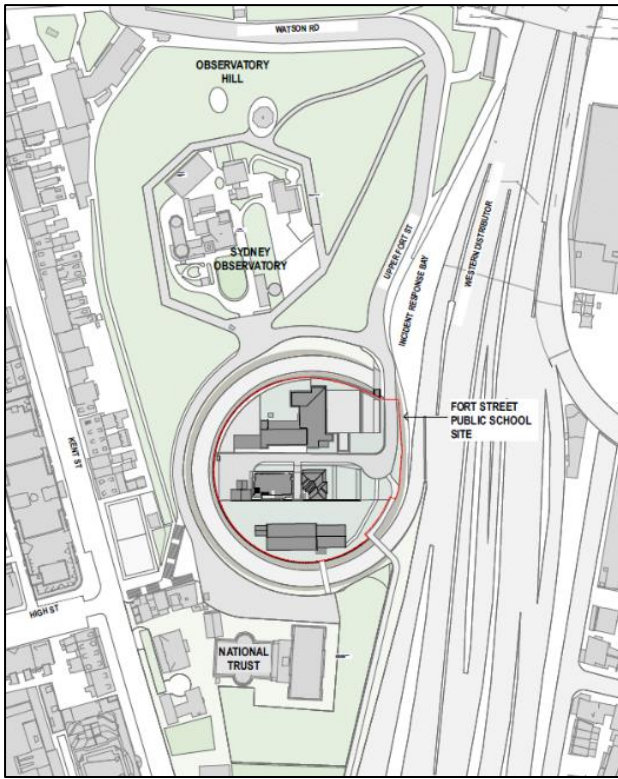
FSPS Location Plan indicating surrounding features (Source: FJMT Studio).
